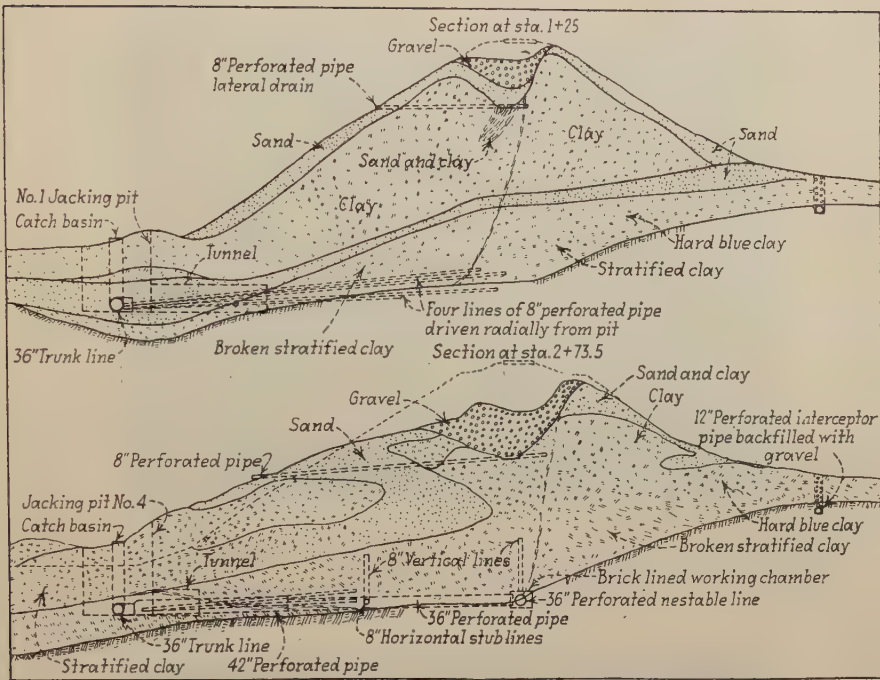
Two cross sections of the embankment showing conditions at the time the drainage system was completed but before the embankment was restored.
